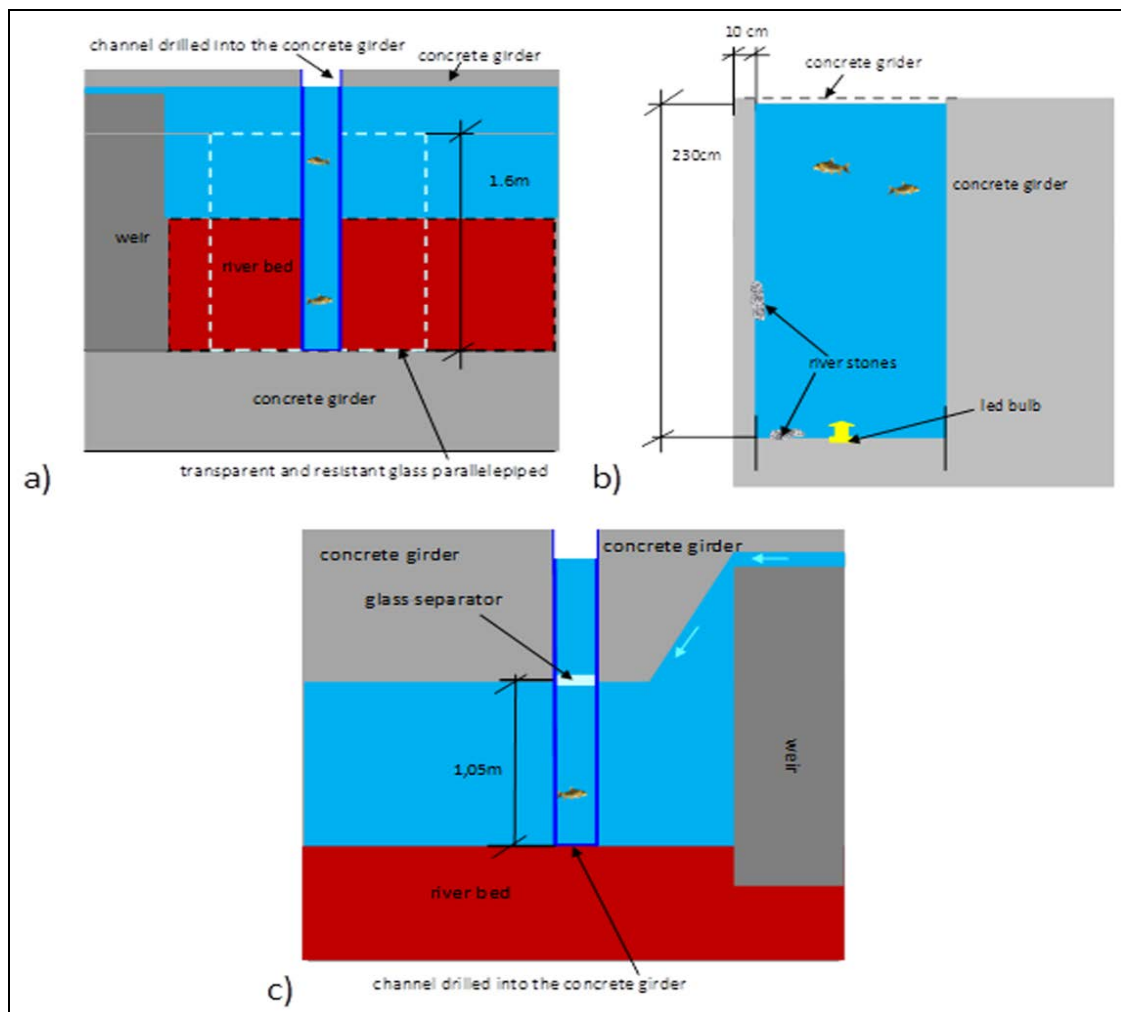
positioning of the channel into the concrete beam/girder – indicative scheme.
